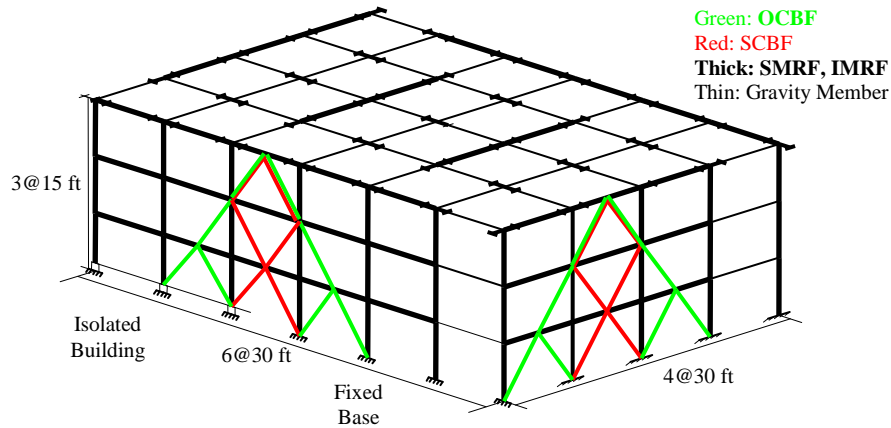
3D view of the building elevation and plan layout, with SMRF and IMRF lateral frames in black, SCBF frames in red, and OCBF frames in green.
